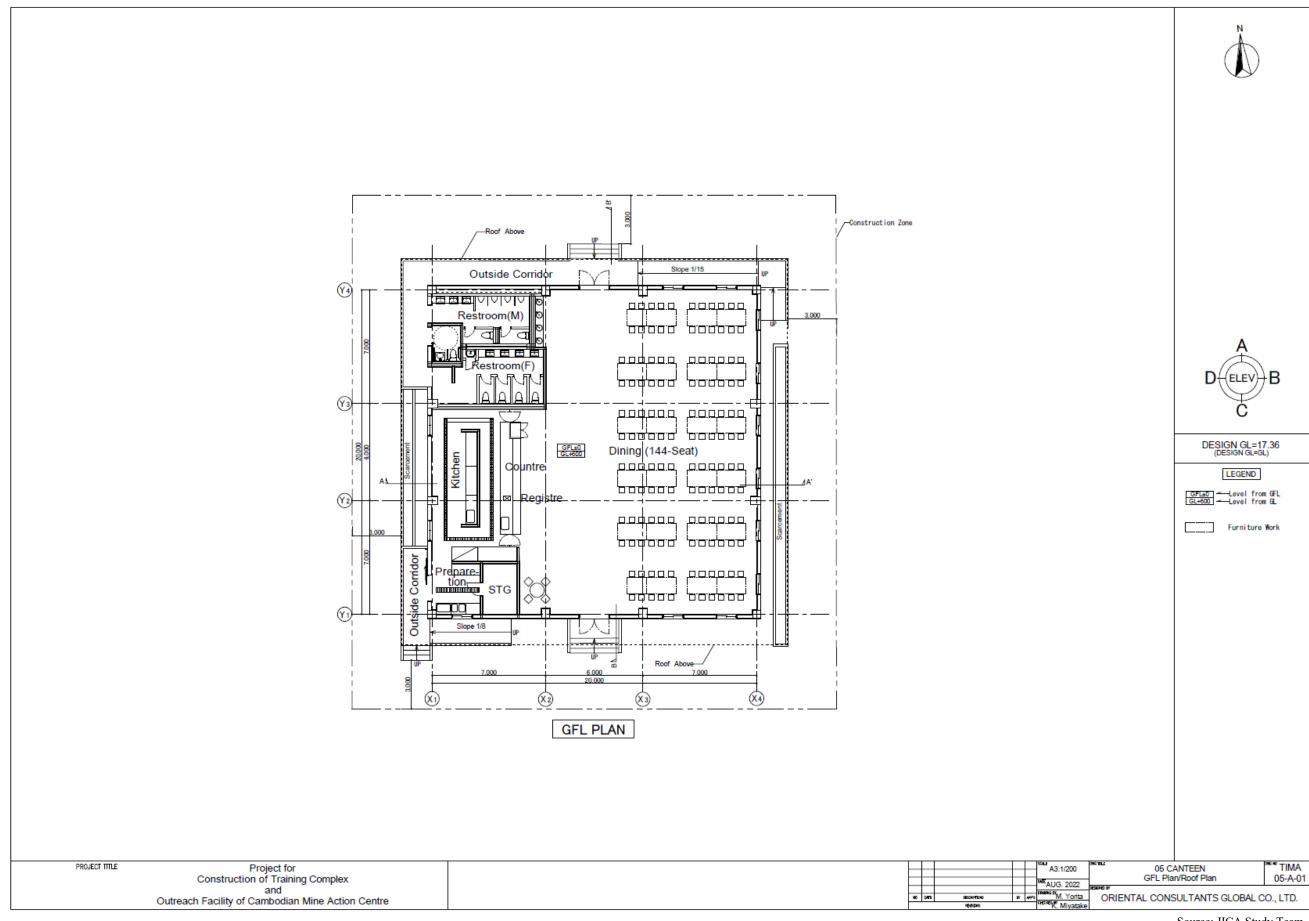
Floor Plan of TIMA Canteen (GFL)
